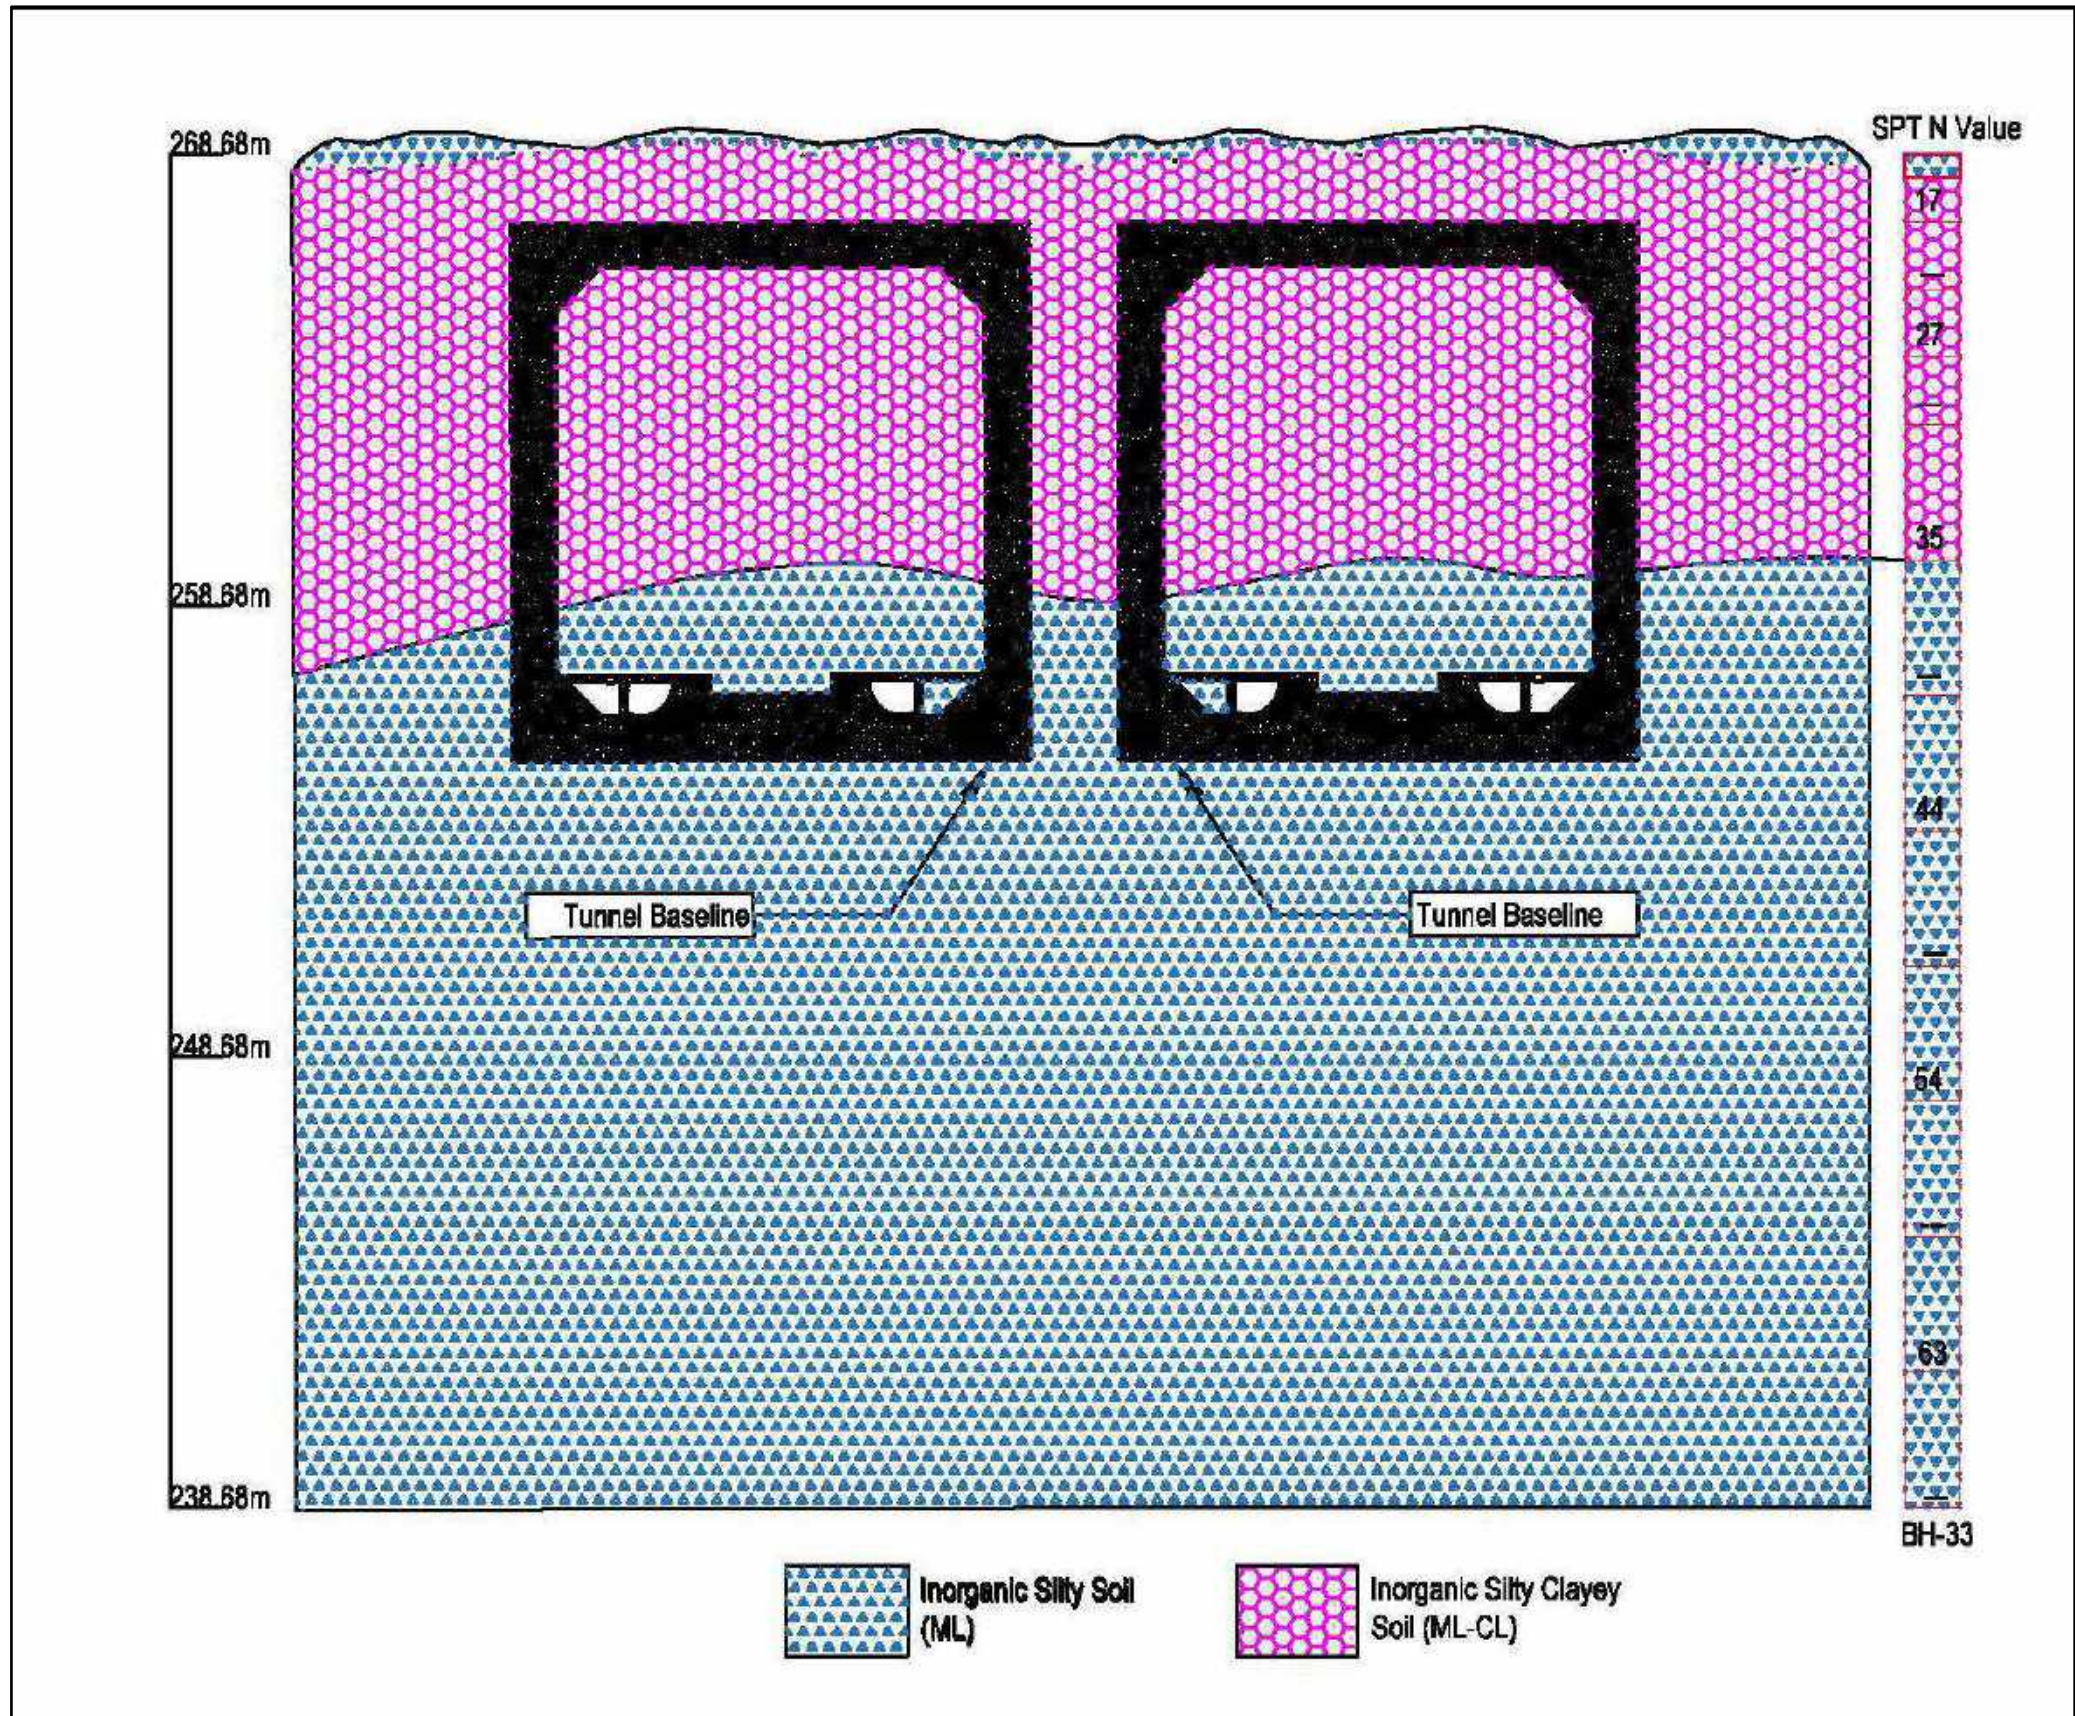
Cut and Cover structure at the end of tunnel – Portal II (CH29600).
